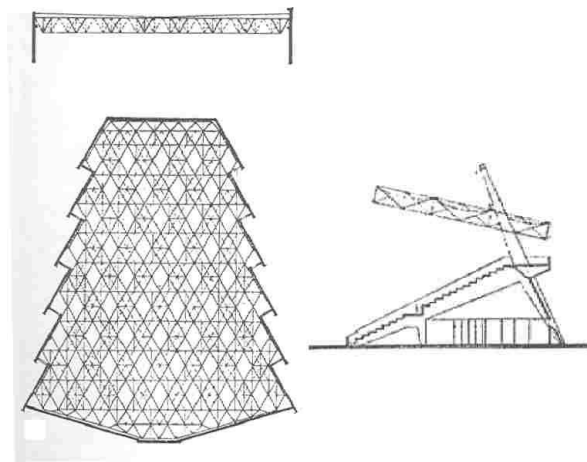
Plan of church of Notre Dame des Foyers in Paris and section of tribunes of the Laval stadium
